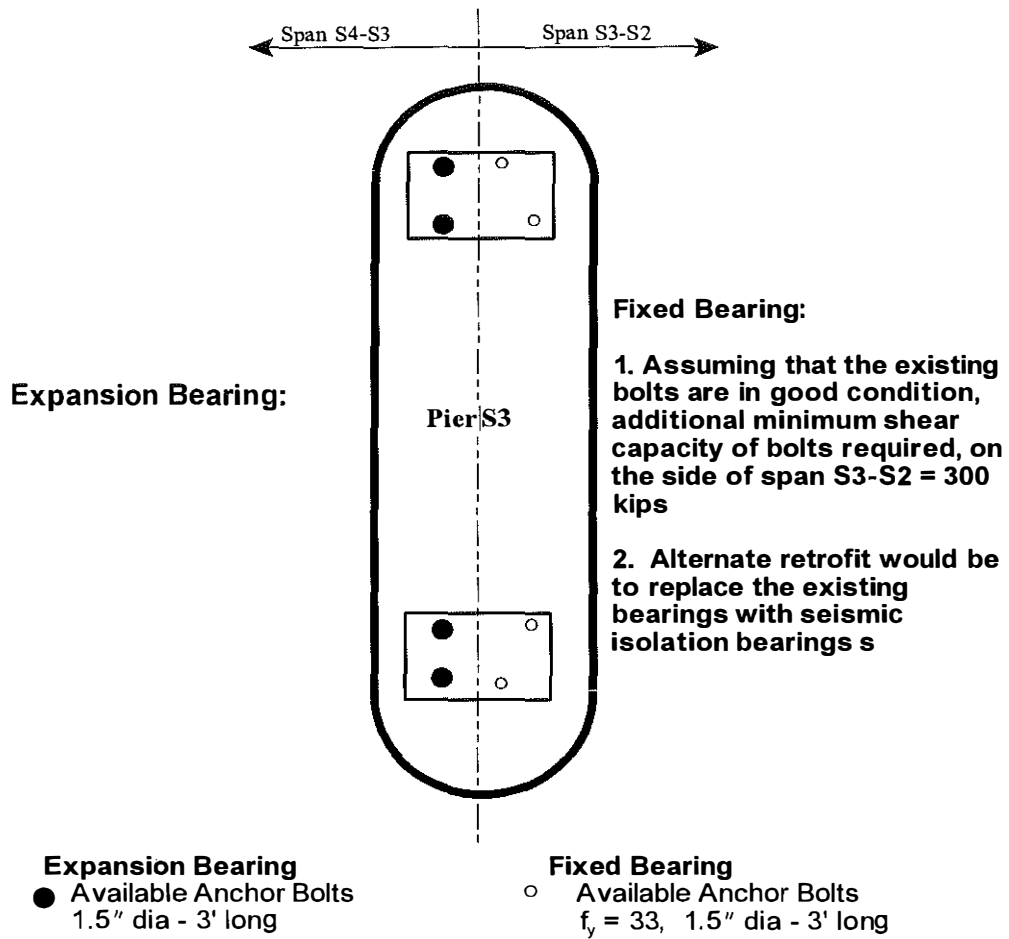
Minimum Required Shear Capacity ( $V_{req}$ ) to be Provided by Additional Anchor Bolts at Bearings of Pier S3 on the Henderson, KY Approach of the US41 Northbound Bridge
